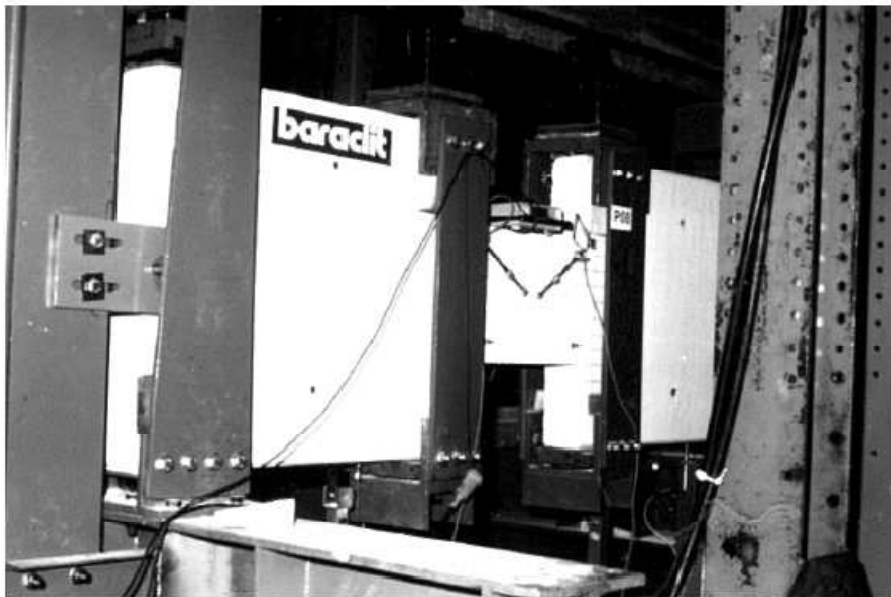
Loading Frame for the Specimen P02 (Galano and Vignoli 2000)
